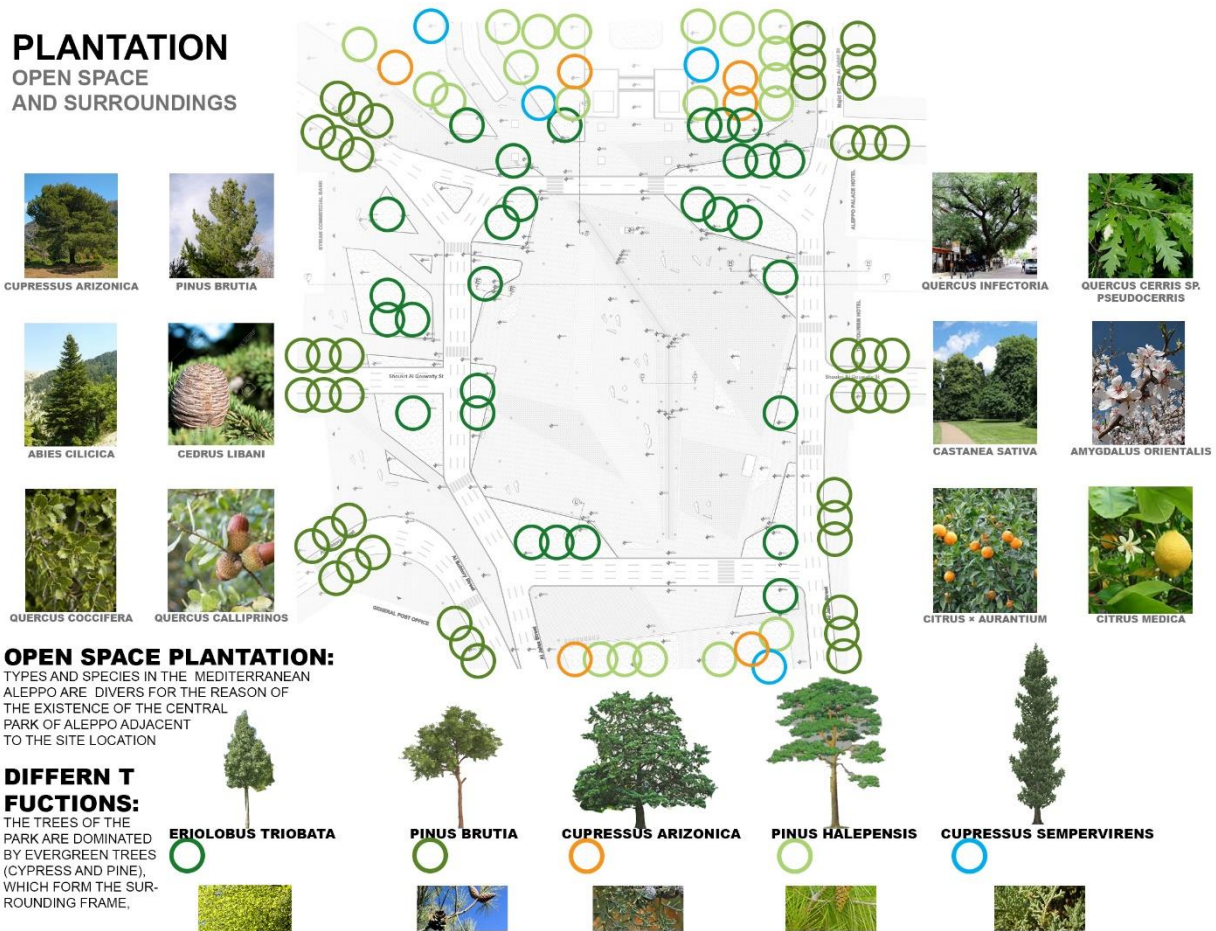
Plantation plan identifying the plant species in the site and surroundings (My work collection).
